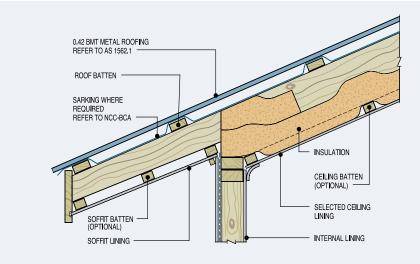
Cathedral Roof/Ceiling Construction. Section through roof
